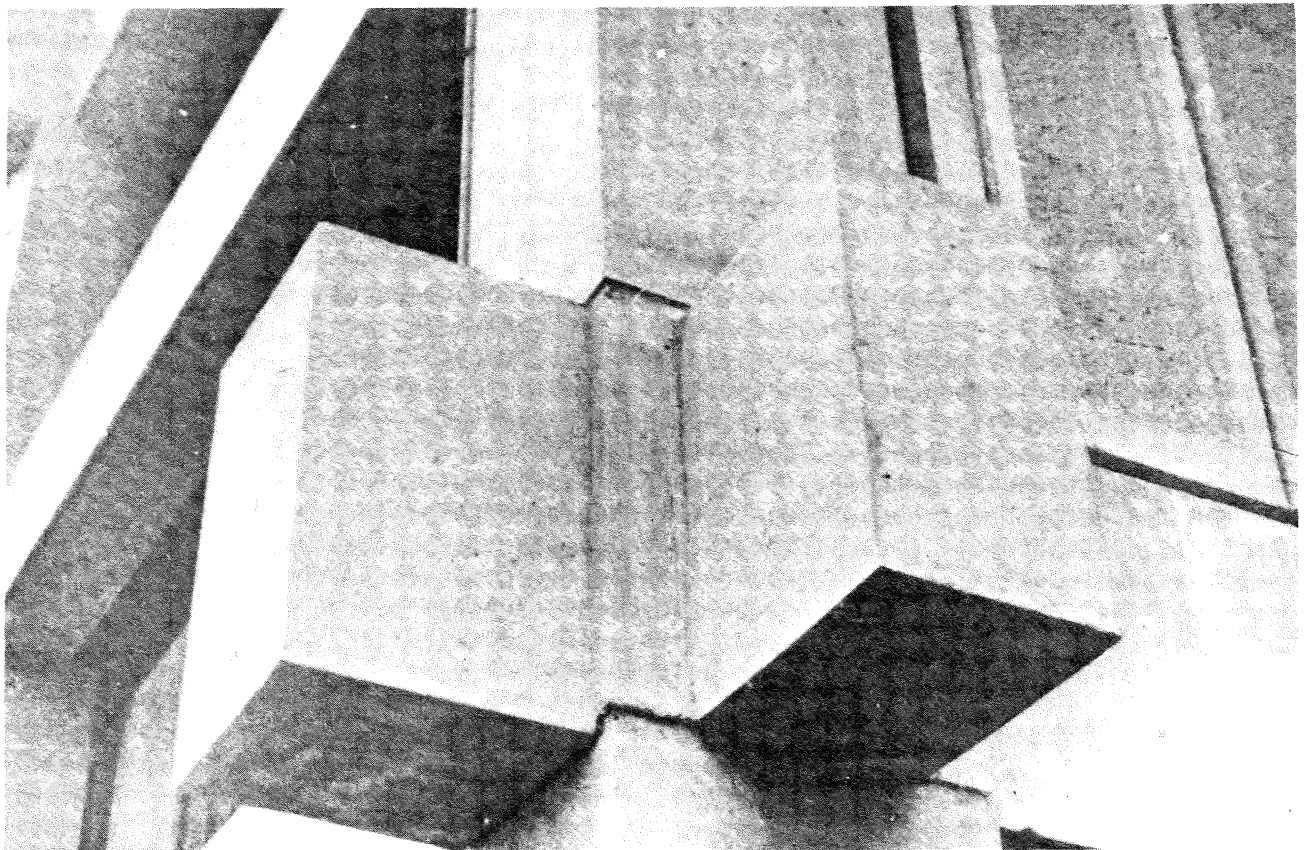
Beam Stub to Improve Behaviour at Exterior Beam-Column Joint
